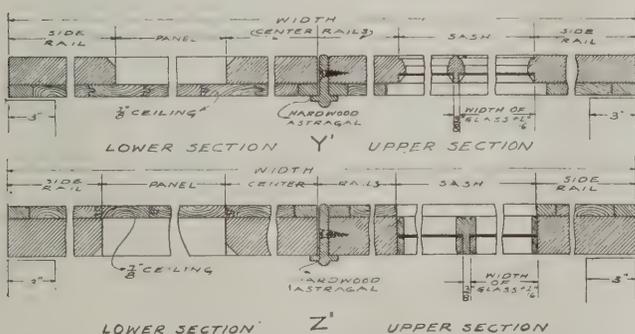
Horizontal Section Through Door Shown in Fig. 15
